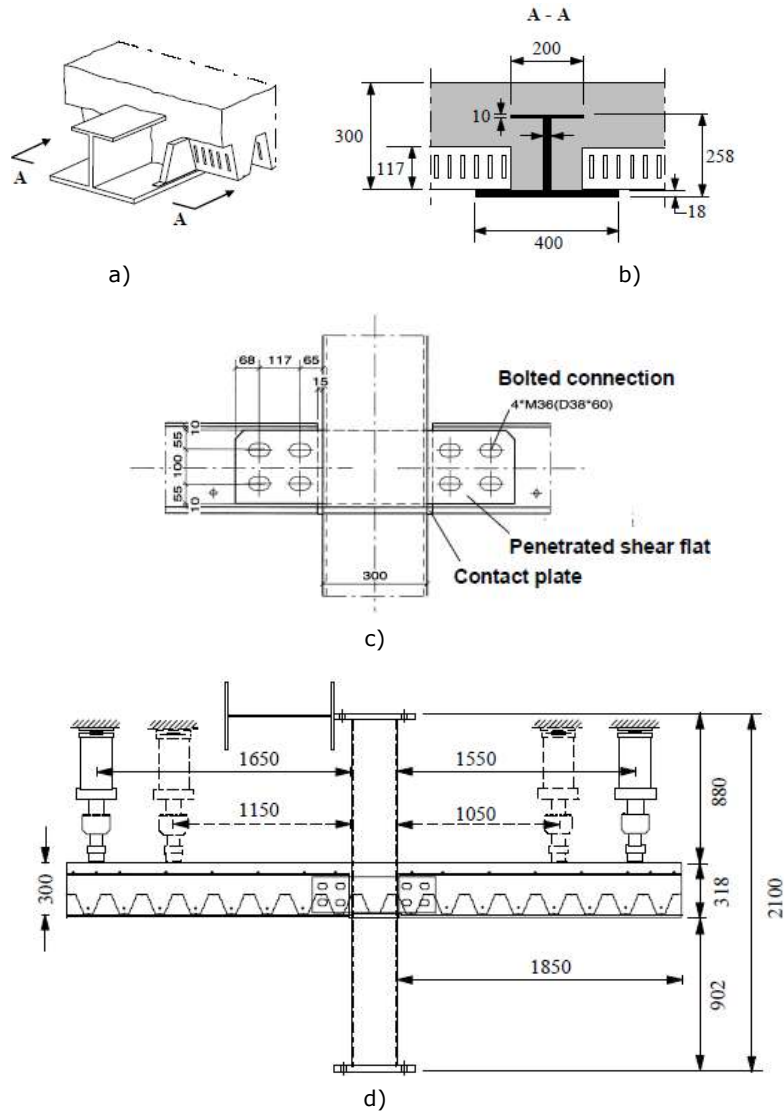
Images from Malaska [31]: a) composite slim-floor system; b) cross section of the composite slim-floor configuration; c) bolted beam-to-column connection; d) test setup
